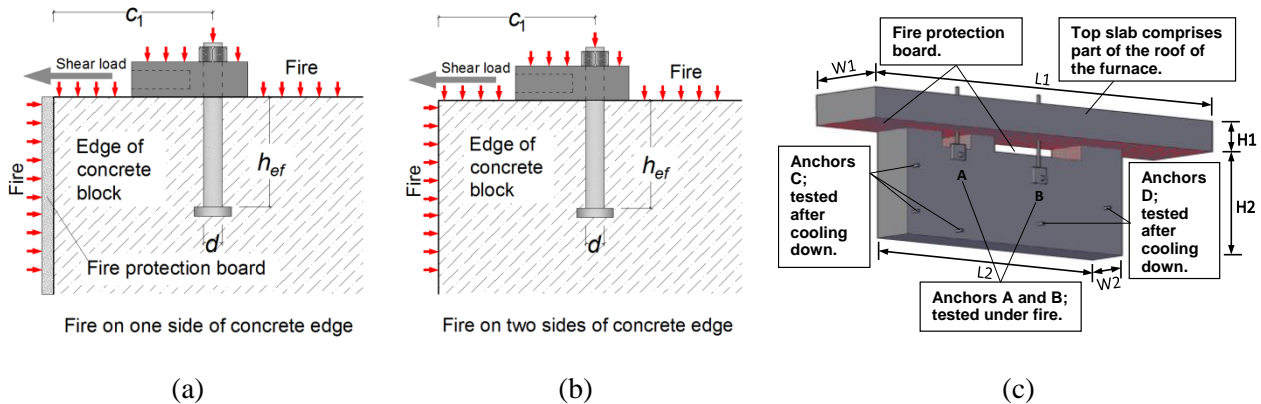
Applied fire and loading for: (a) fire on one side of concrete edge, (b) fire on two sides of concrete edge and (c) concrete specimen.
